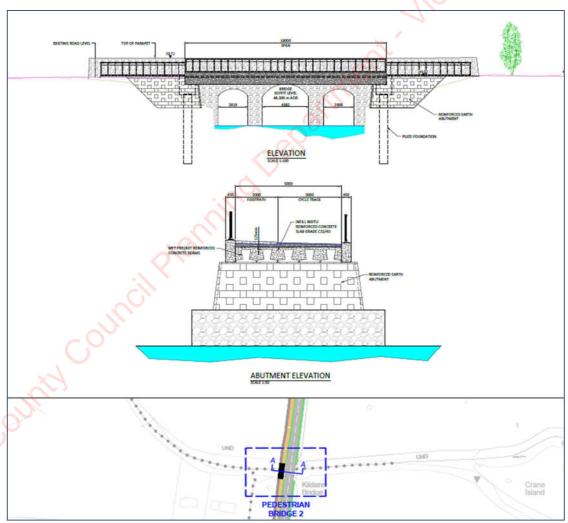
Proposed Kildare Bridge (Pedestrian Bridge 2) – Imagery extracted from Planning Drawings (OCSC, 2022)
